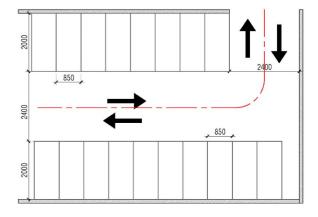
Minimum dimensions for 90° motorbike parking one-way
